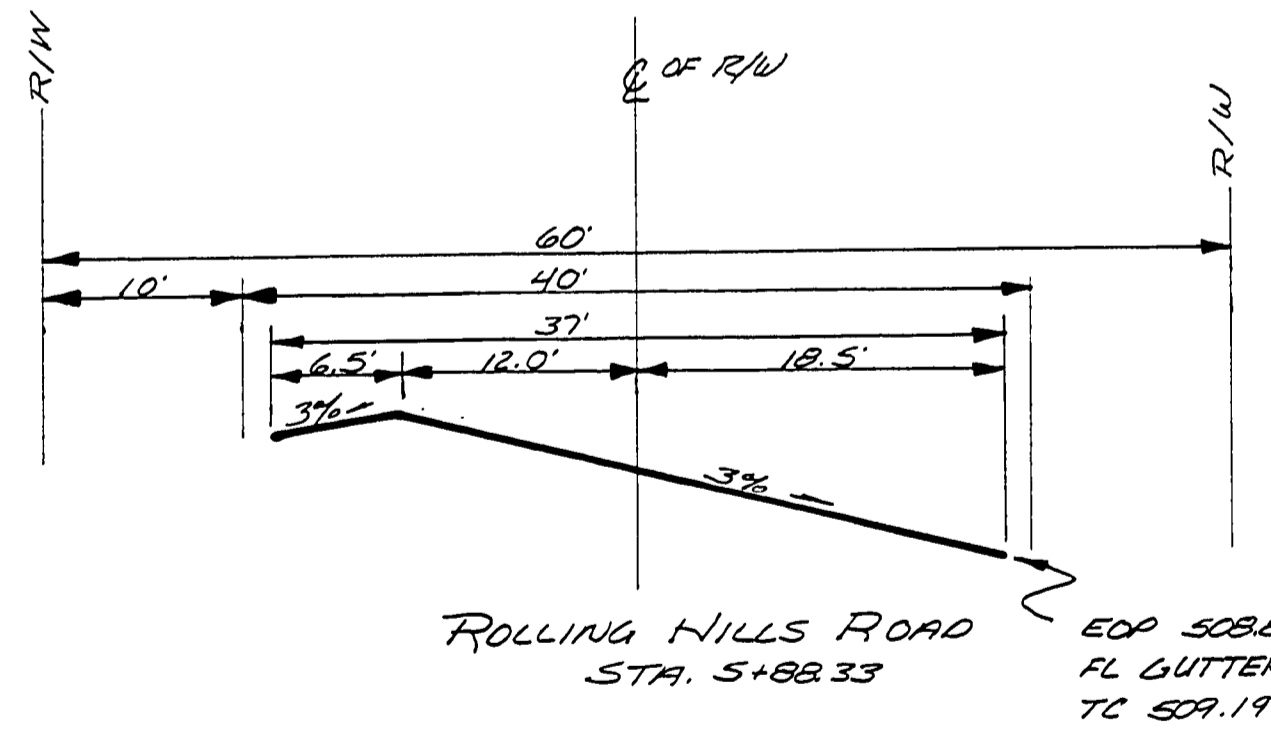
SINGLE PLAN AND CROSS SECTION FULL SIZE
